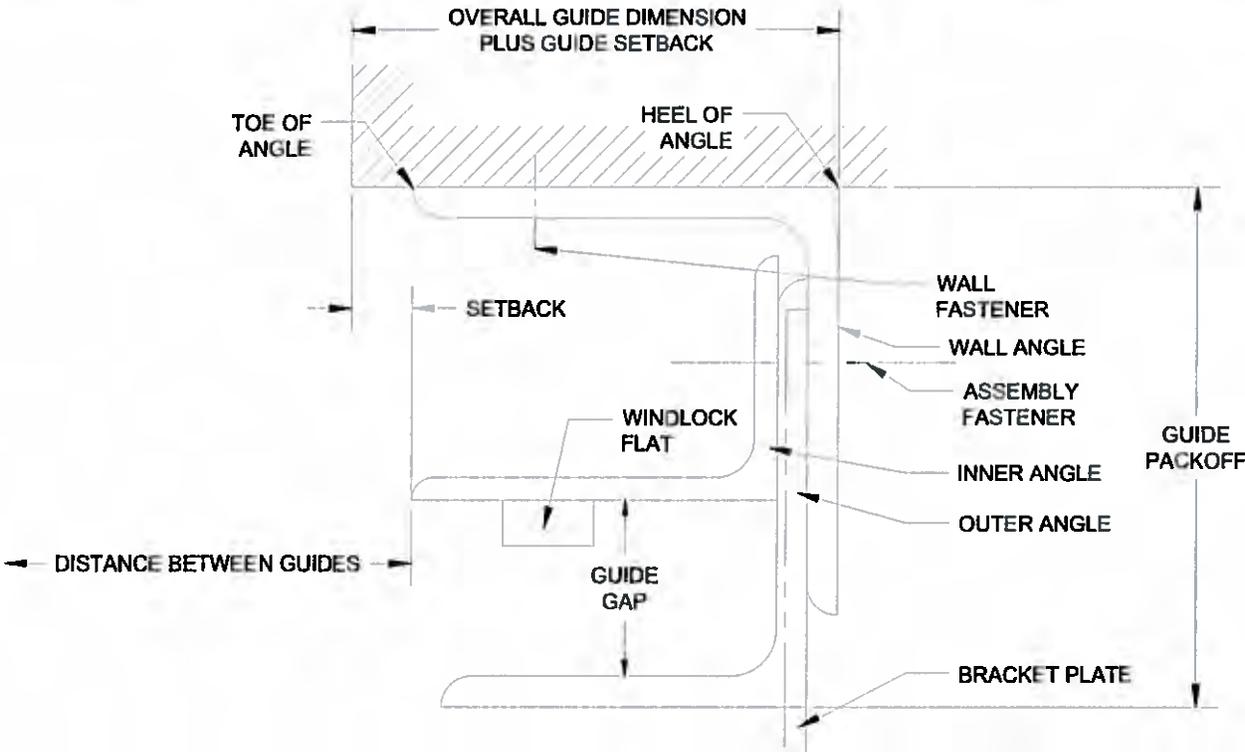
Face of Wall "E" Guide with Windlock Flat
